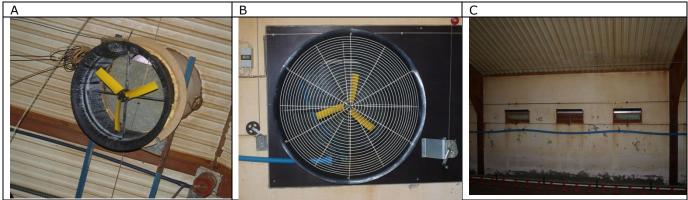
Pictures of air anemometers in ridge ventilation ducts (A) and in the ACU ventilation outlets (B). C shows the adjustable flap ventilation ducts for inflow of air.
